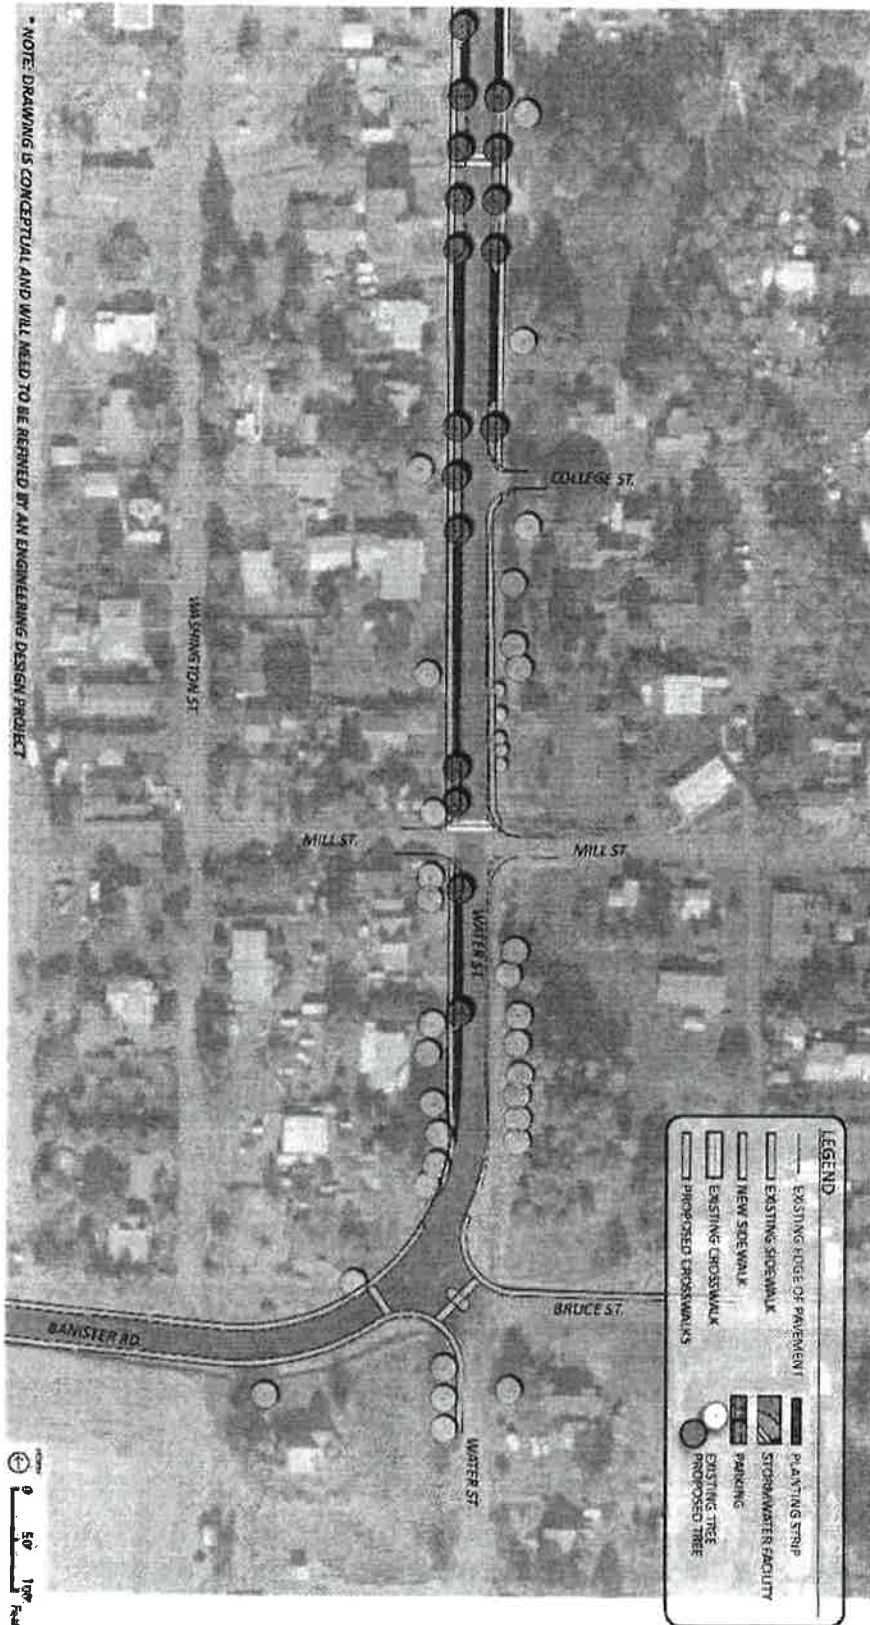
Project #1 - Water Street Improvements – Southern Section
